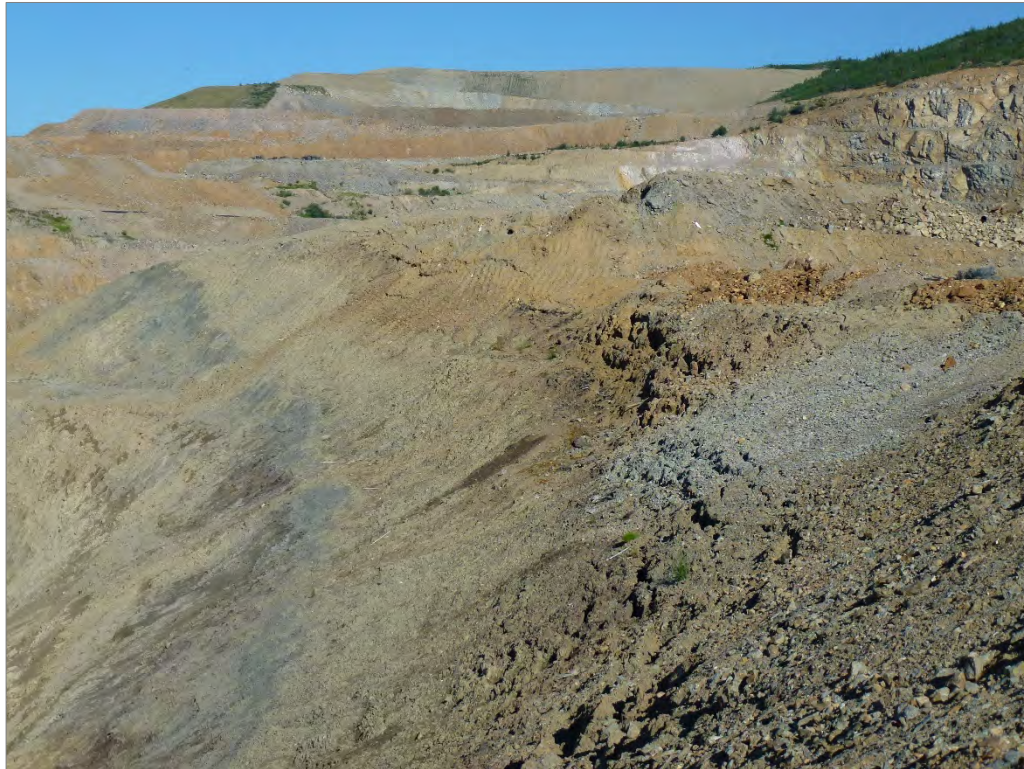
Tension cracking in the Area 2 Pit Stage 3 pit wall caused by slumping of the permafrost soil (looking northwest)
